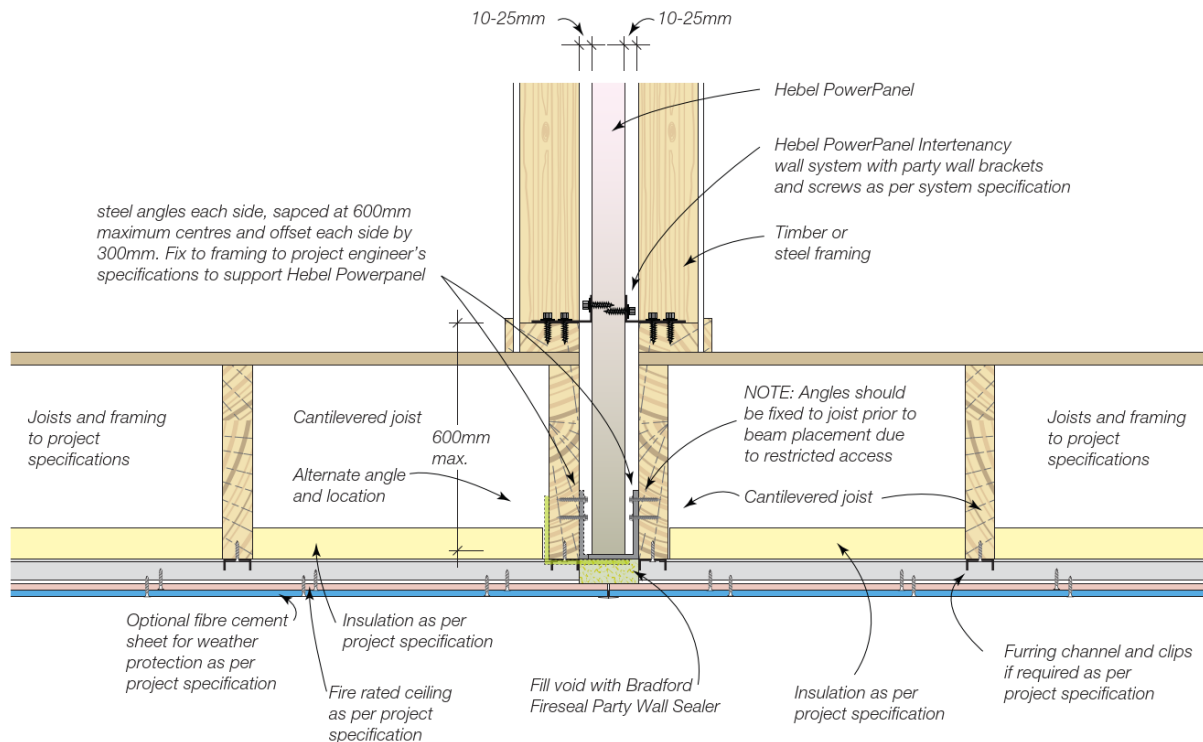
Cantilevered intertenancy system supported with steel angles – level soffit – 1
